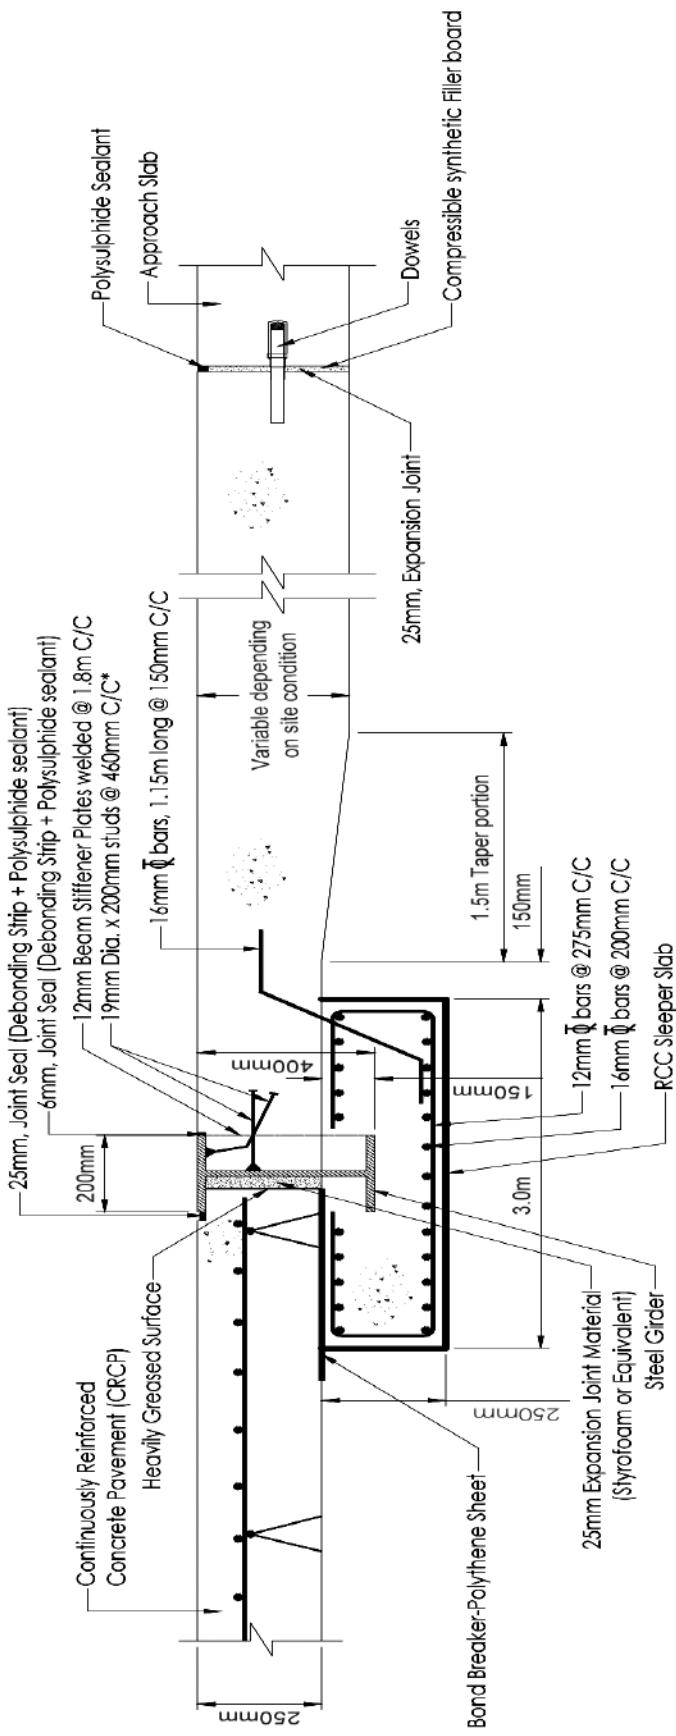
Transition Details of a Wide Flange Beam Terminal Joint
